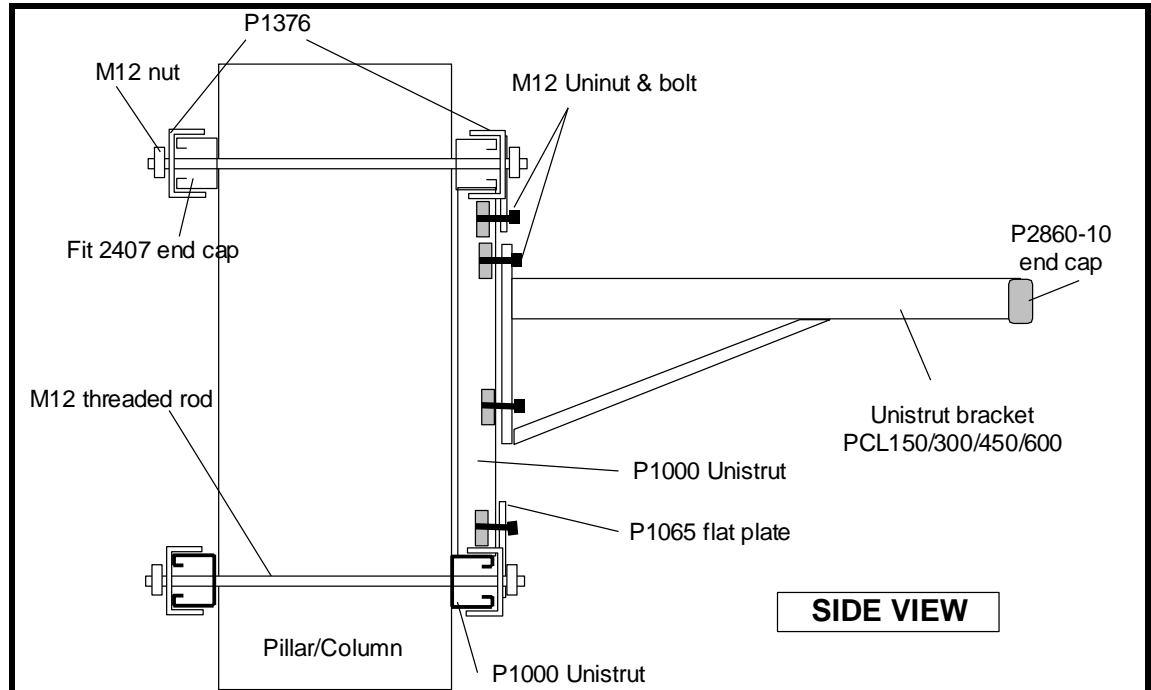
Cantilever Bracket Mounted on Pillar (Side View)
